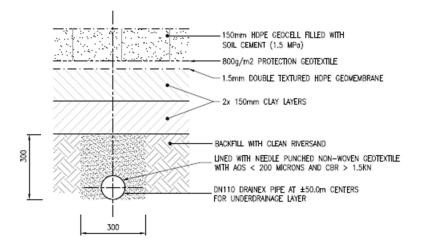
Evaporation Pond - Typical Barrier System Detail
